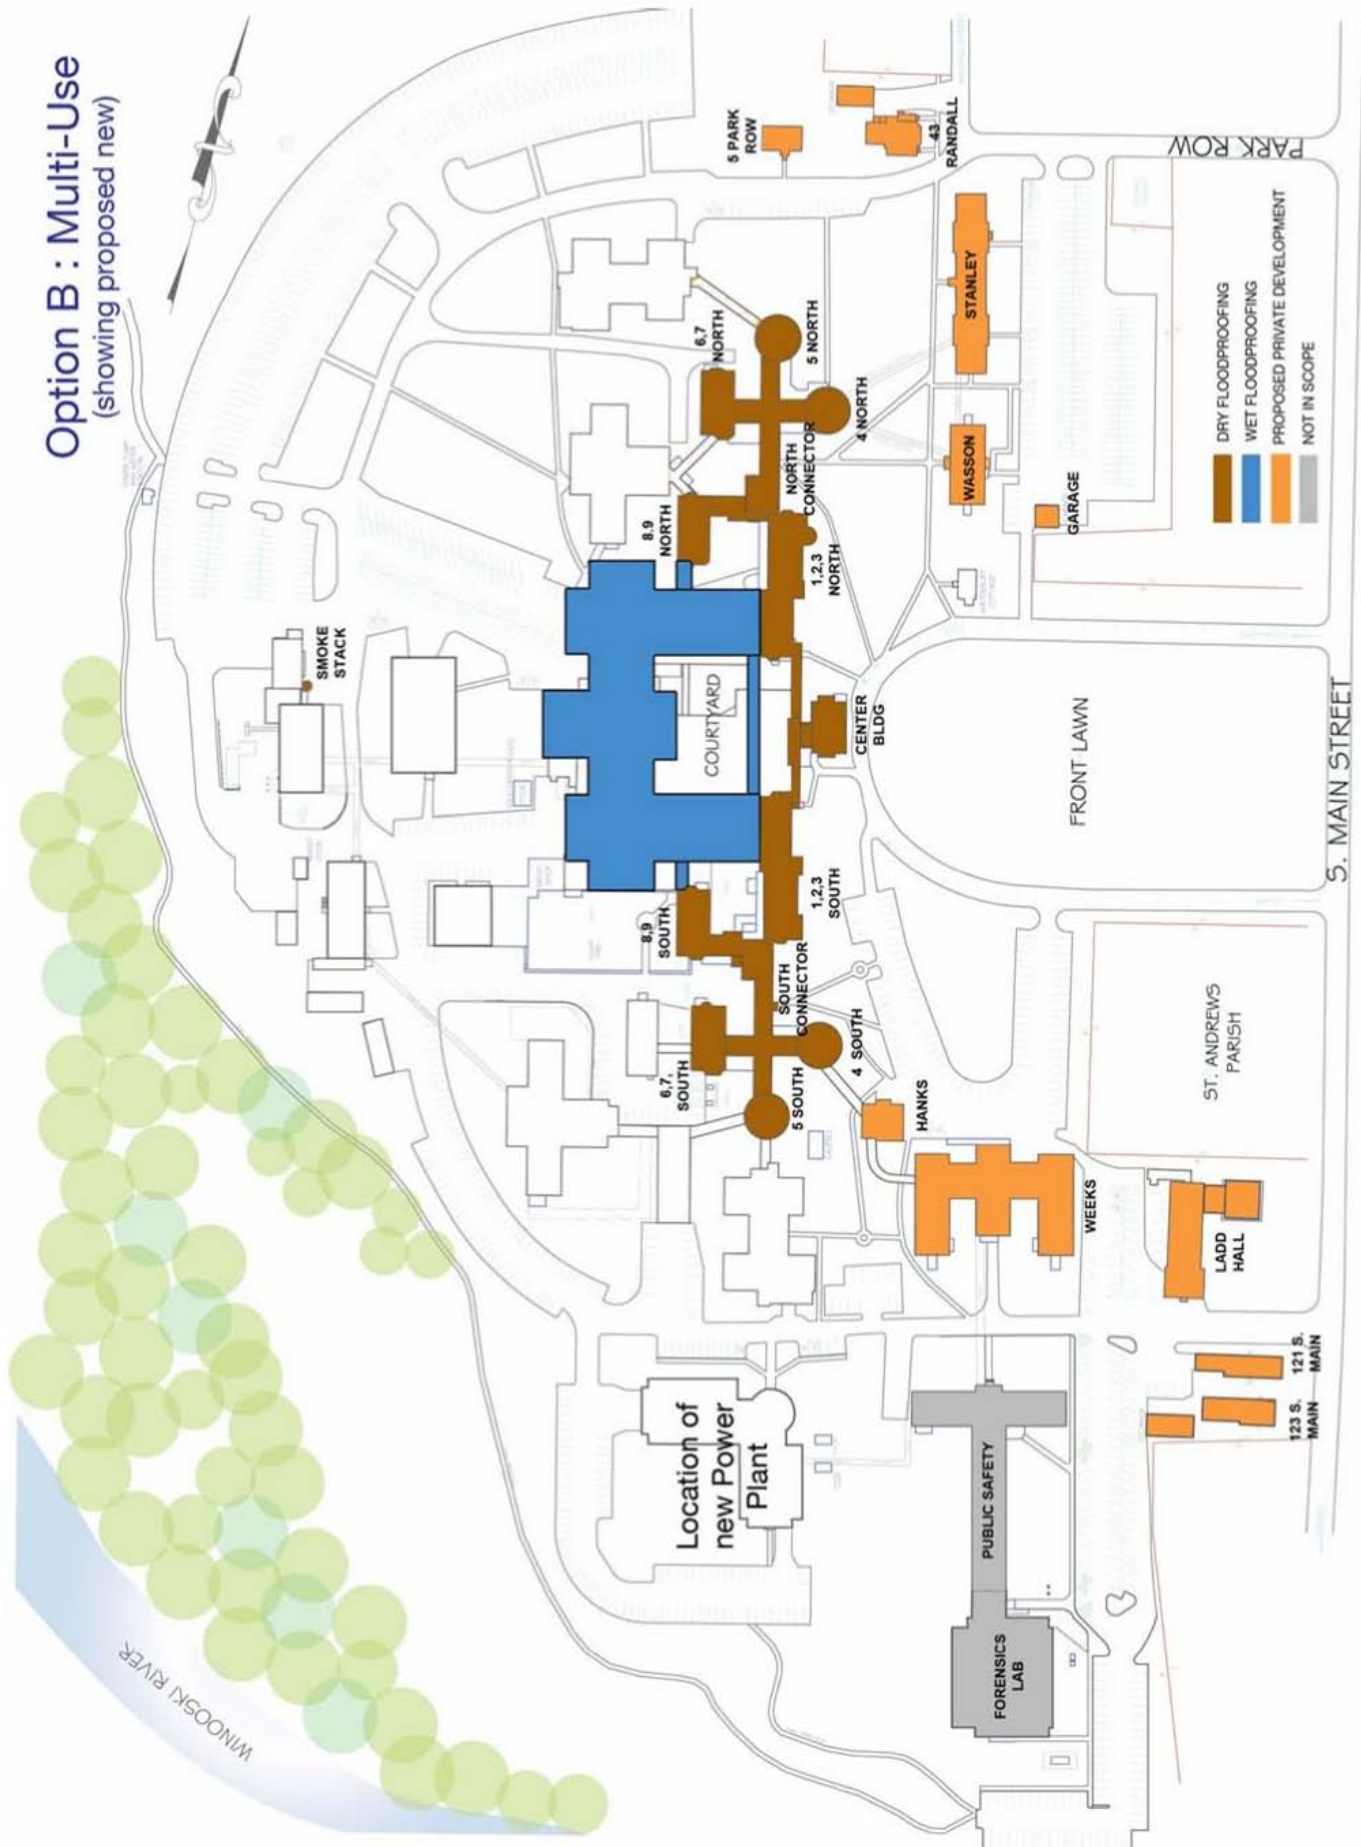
Floodproofing Options and Buildings To Be De-Accessioned.
